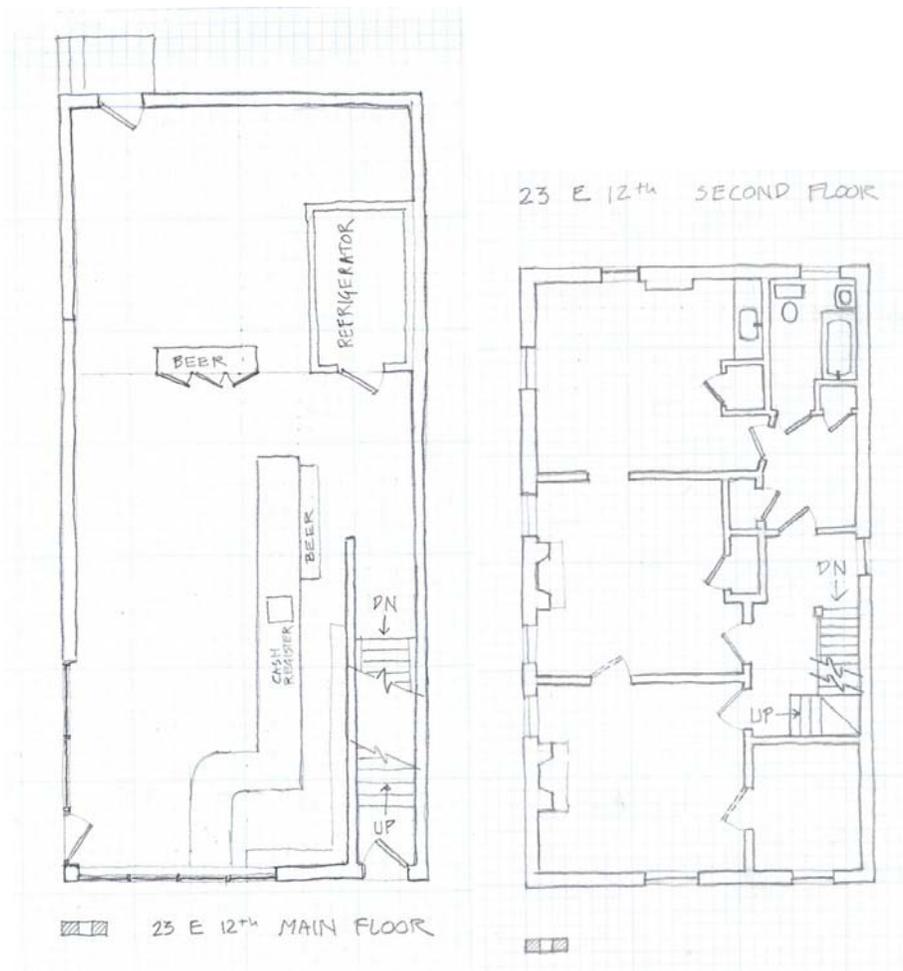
23-25 East 12th Street, first and second floor plans, drawing by Bill Macintire.
